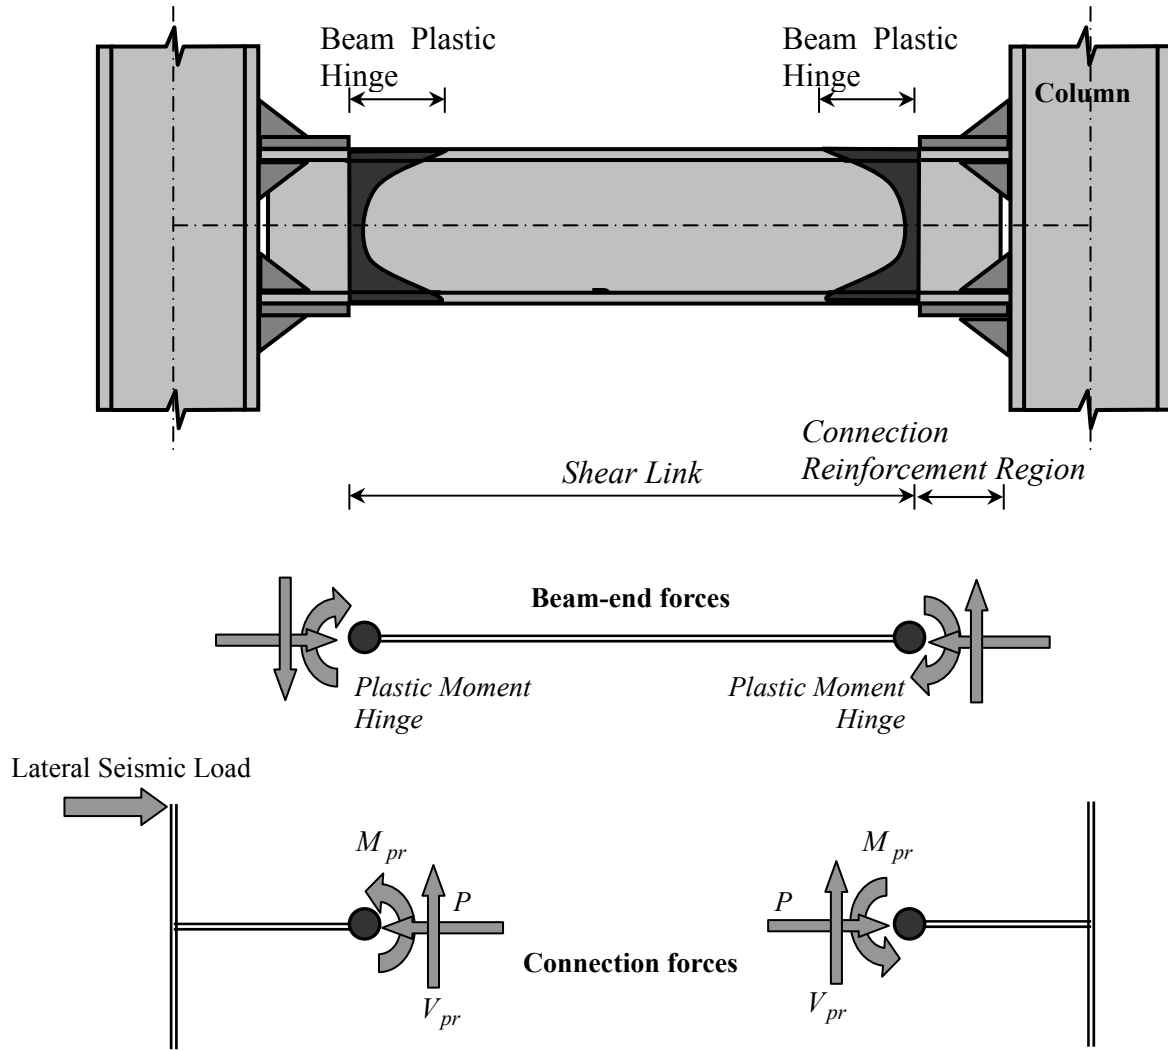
Location of Ductile Plastic Hinges Adjacent to Beam-to-Column Connections: Connection Reinforcement Elements help in Pushing the Inelasticity Away from the Column Face
